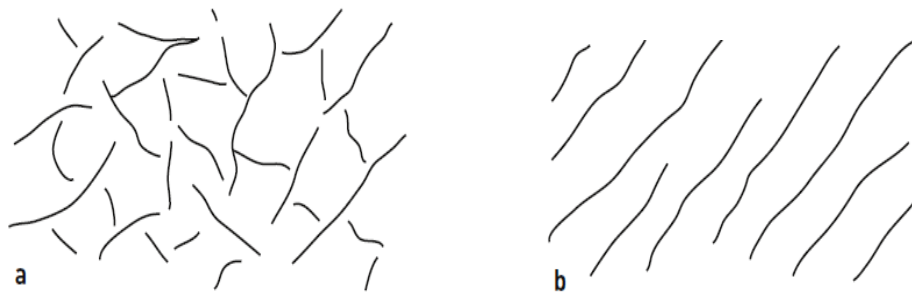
Typical plastic shrinkage cracking (Cement concrete and aggregates, 2005)
